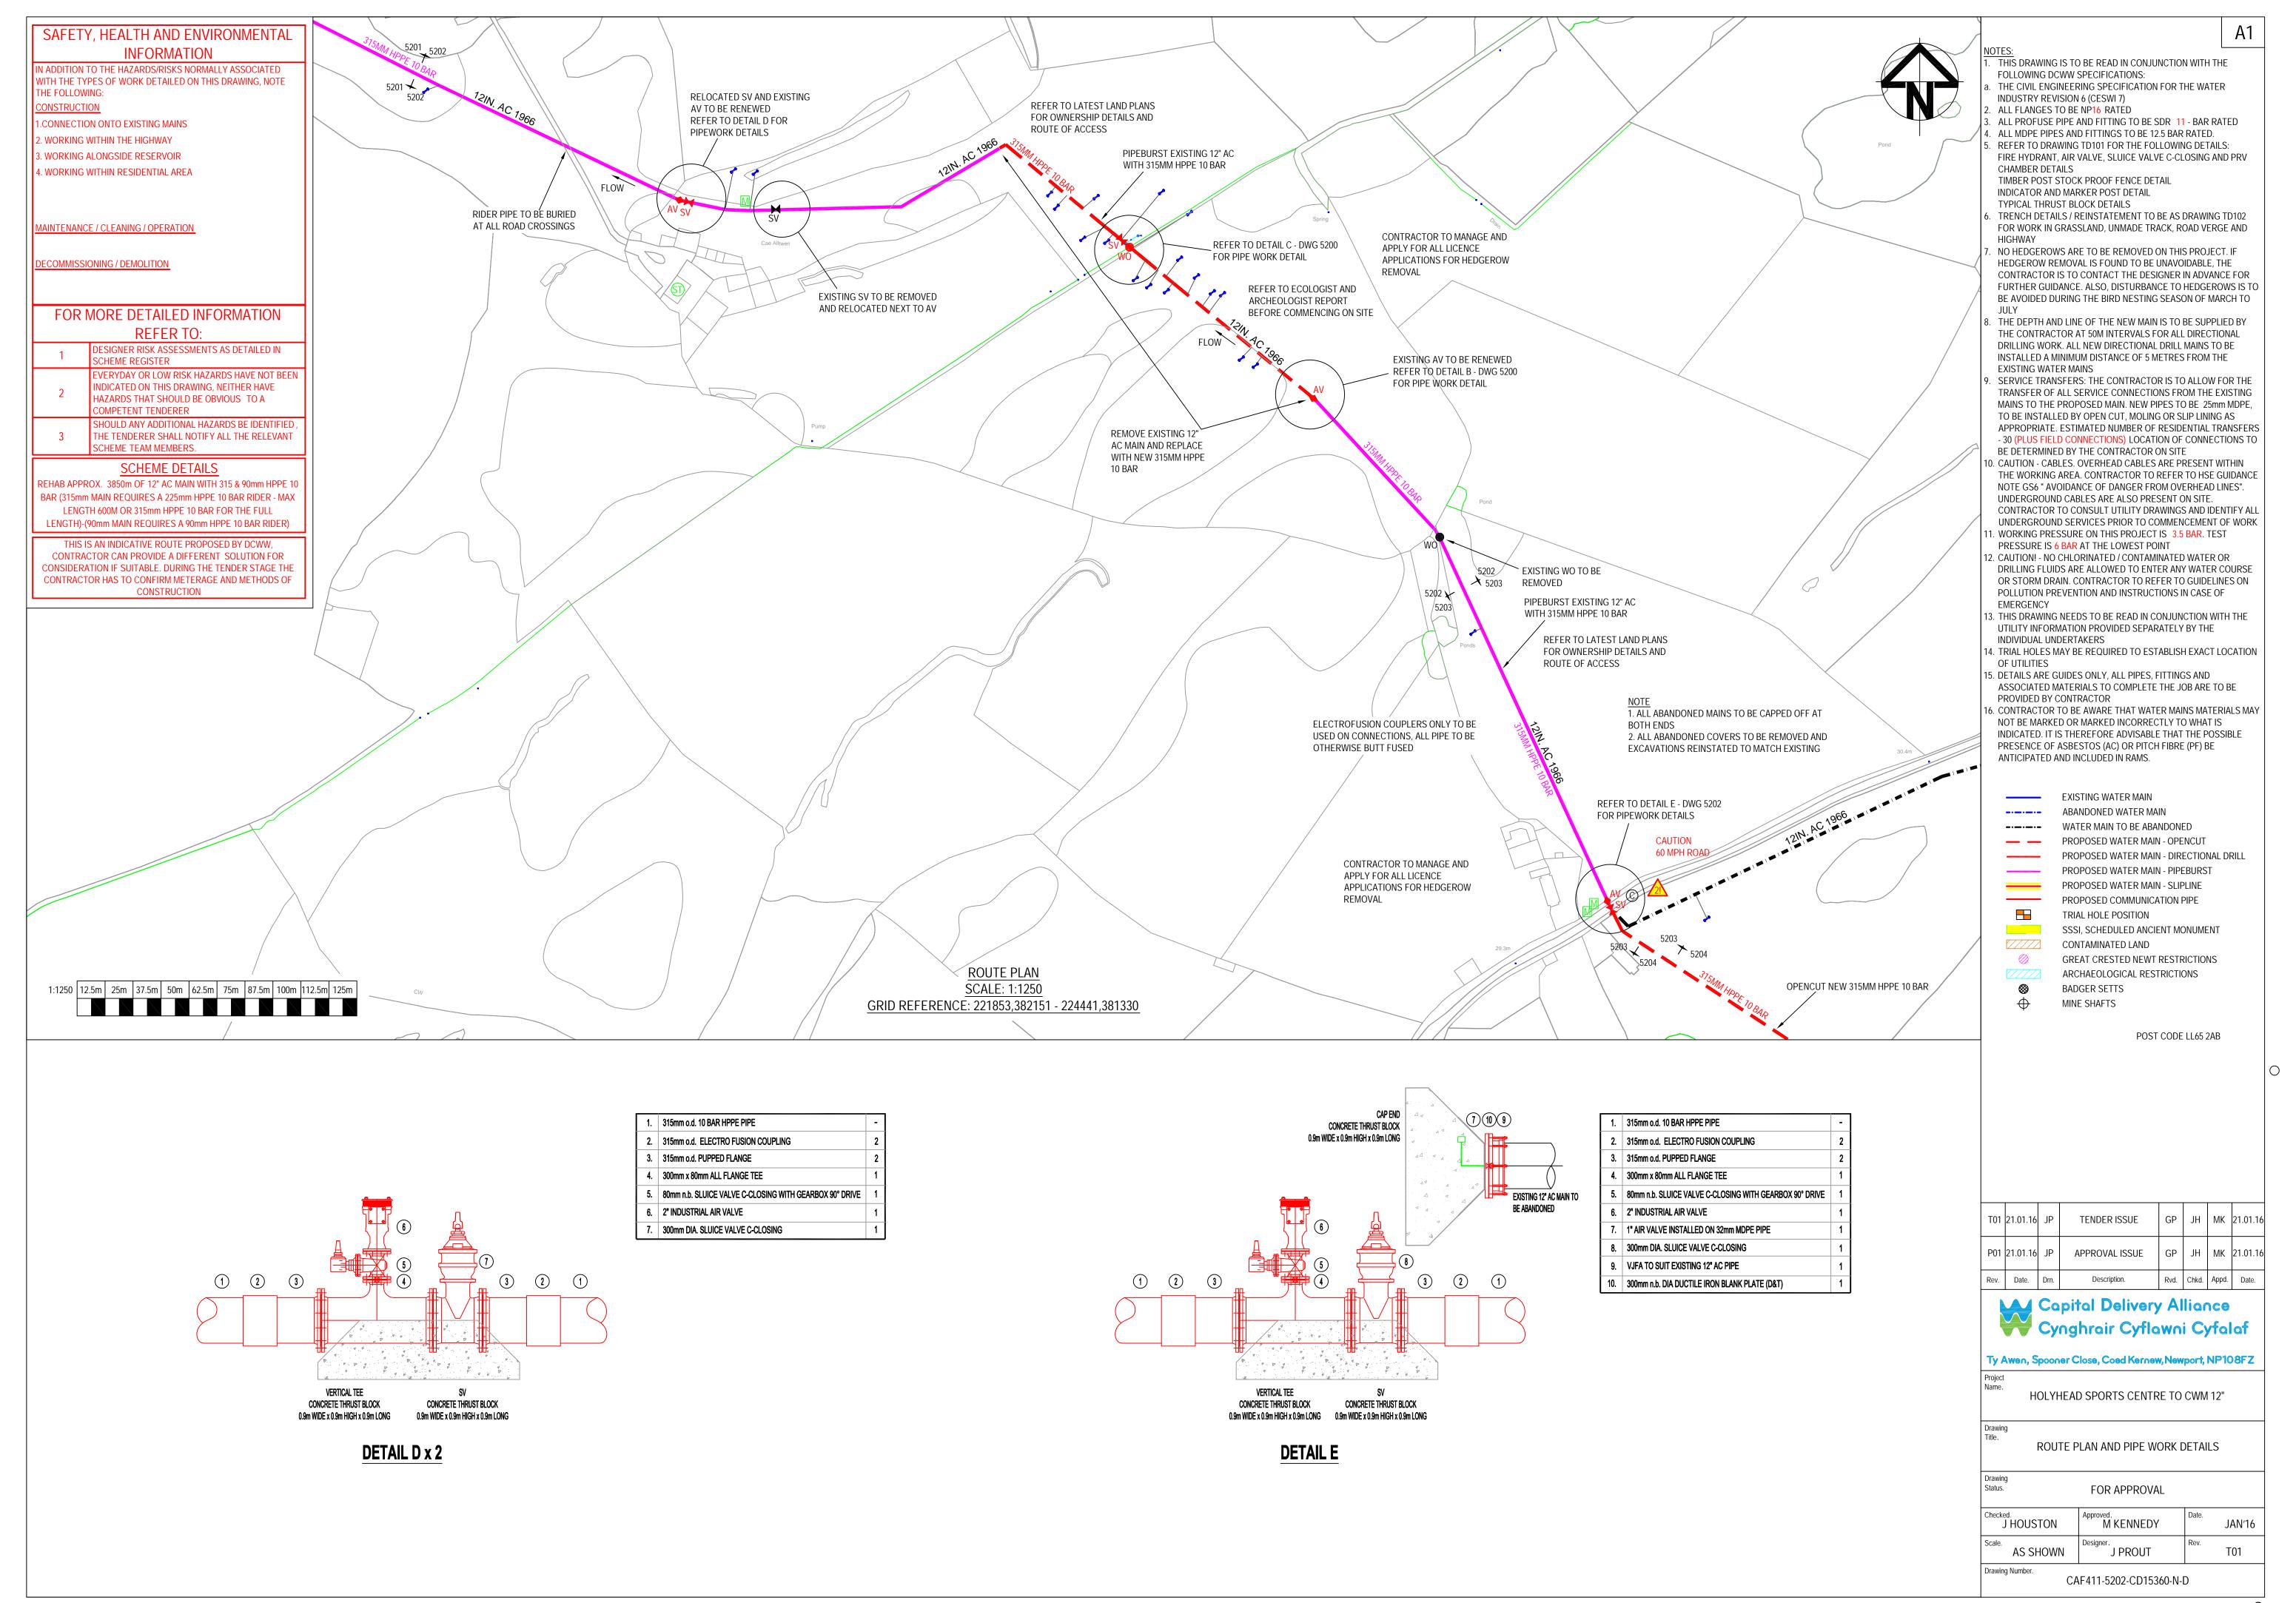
Reproduction of Dwr Cymru Drawing CAF411-5202-CD15360-N-D-T01, detailing Section A to B that will include pipe burst (purple line) and open cut (red dash)
